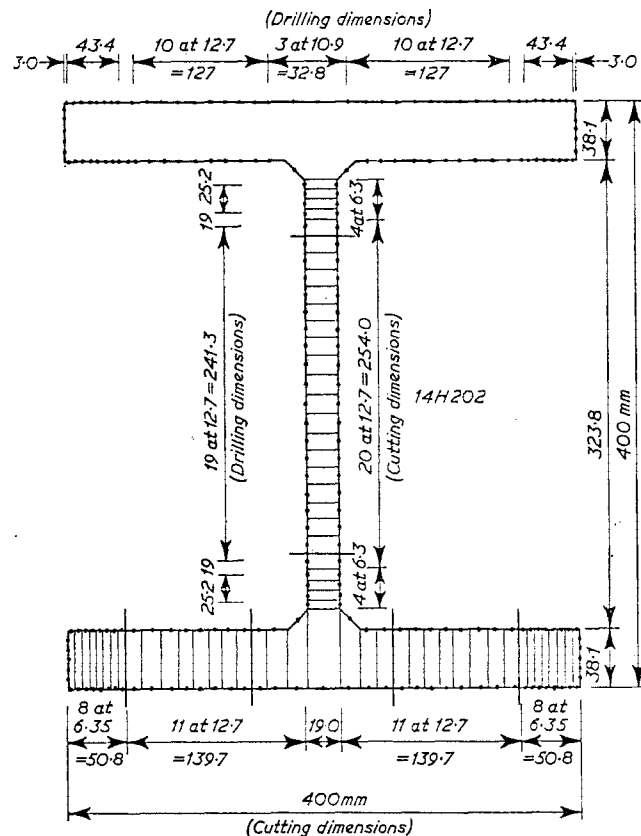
Gauge hole location and sectioning detail (dimensions originally in inches)
